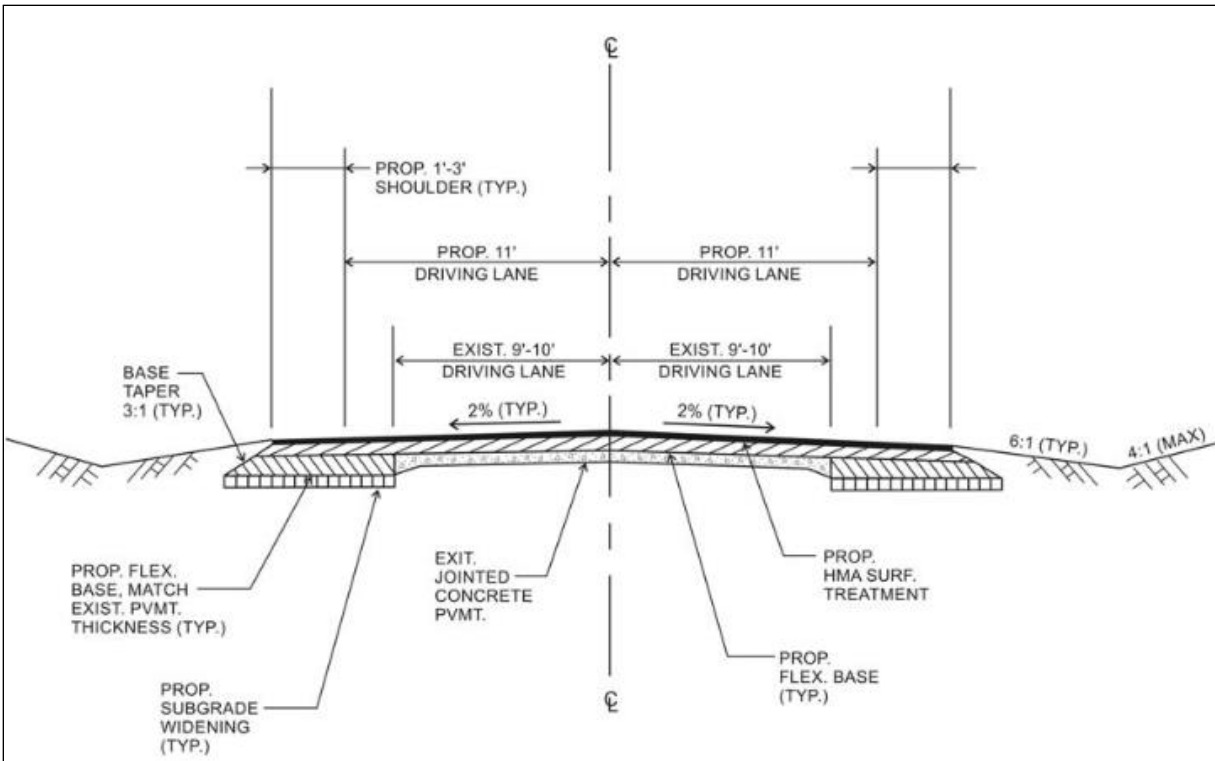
Typical Section for Widening Jointed Concrete Pavements.
